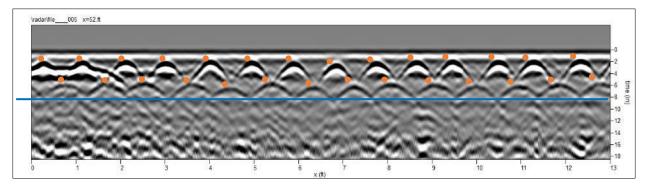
Example GPR scan from Abutment 5 (Line 5). Shows rebar locations and possible location of girder
